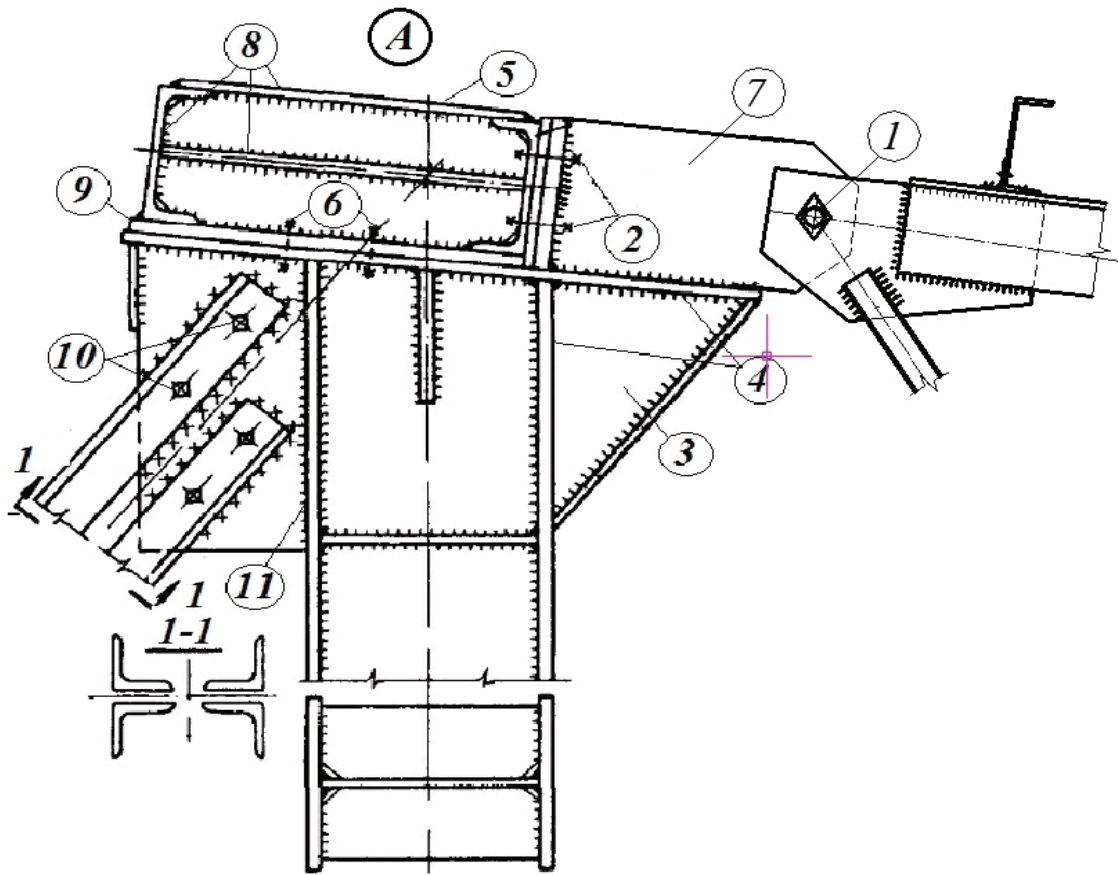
Bearing joint of suspension roof with carrying elements of rolling steel. Starting from the actual operation of such joint, its failure can occur in consequence of: 1 – a sheeting bolt shearing of carrying filament to a gusset; 2 – a break of sheeting bolts of a bearing flange to the external metal outline of a rectangular section; 3 – bearing strain of an assemble table; 4 – caving of an assemble table because of failure of welds of sheeting of a table to a column; 5 – loss of general stability of external bearing outline (in a span); 6 – a break of sheeting bolts of the external outline to a column; 7 – caving of a gusset of a sheeting of a carrying filament to the external outline because of failure of sheeting welds; 8 – loss of stability of sectional elements of the external bearing outline; 9 – bearing strain in the spot of a resting of the external bearing outline to a column; 10 – bolts shearing of guy sheeting to a gusset; 11 – caving of guy sheeting gusset to a column because of failure of sheeting welds to a column.
